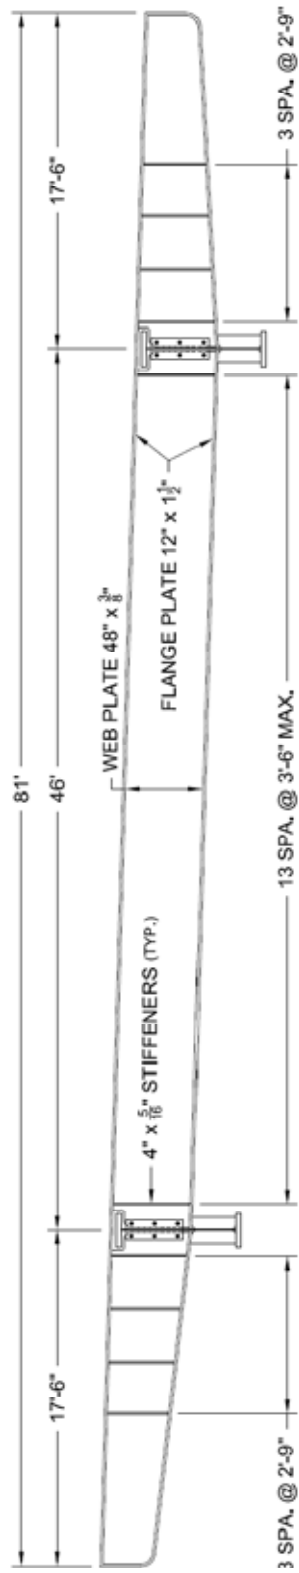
Sections F14N Floor Beam 2 Elevation
